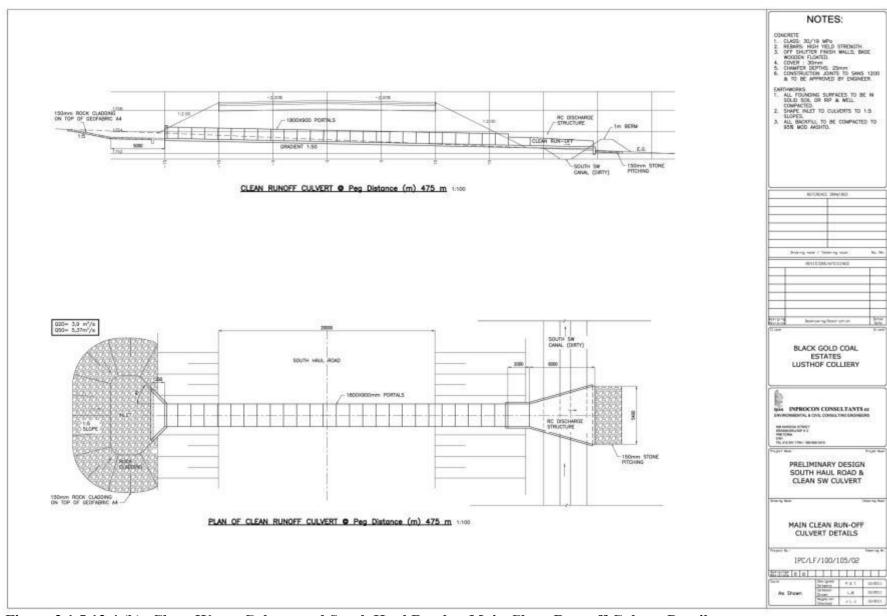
(b): Clean Water Culvert and South Haul Road - Main Clean Run-off Culvert Details.
